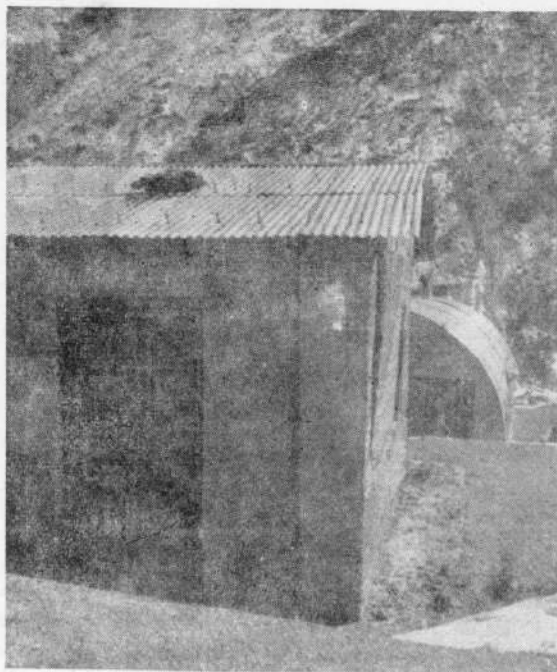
Tilting of filler walls made of hollow concrete blocks near Sumdoh village.
